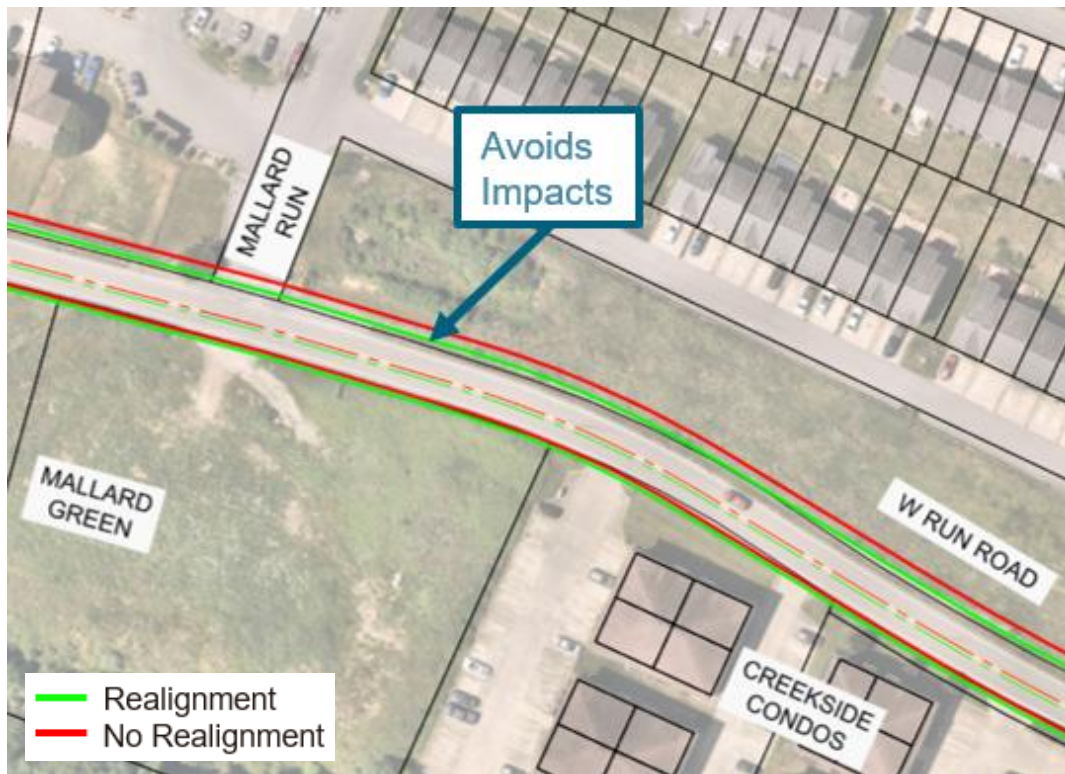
Impacts of “Just Right” Typical Section With and Without Roadway Realignment
